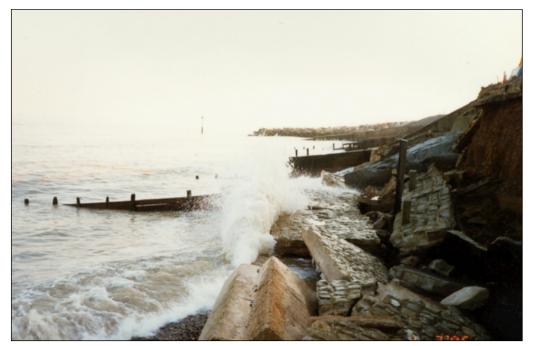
Failed Seawall at Reculver caused by the 1996 Storm
